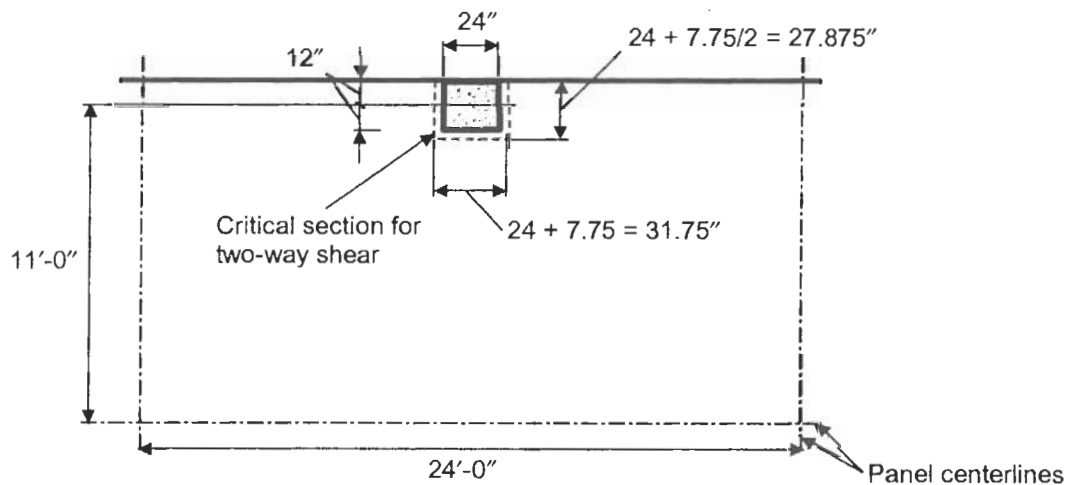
Critical Section for Two-way Shear at Exterior Column
